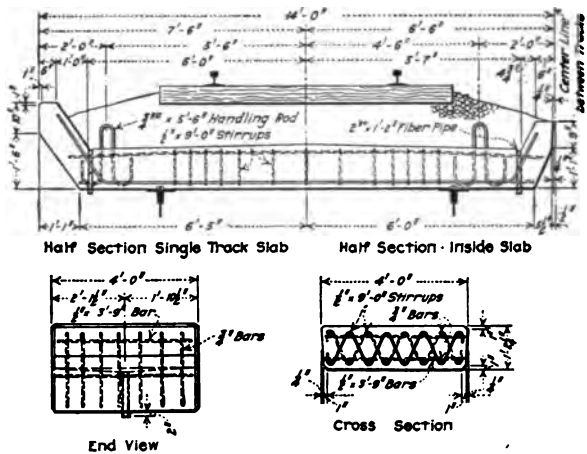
Standard reinforced-concrete slab for deck girders of C. M. & St. P. Ry.
